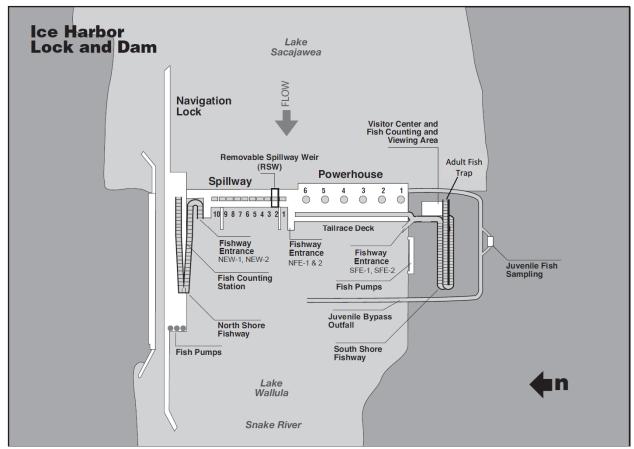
Ice Harbor Lock and Dam General Site Plan
